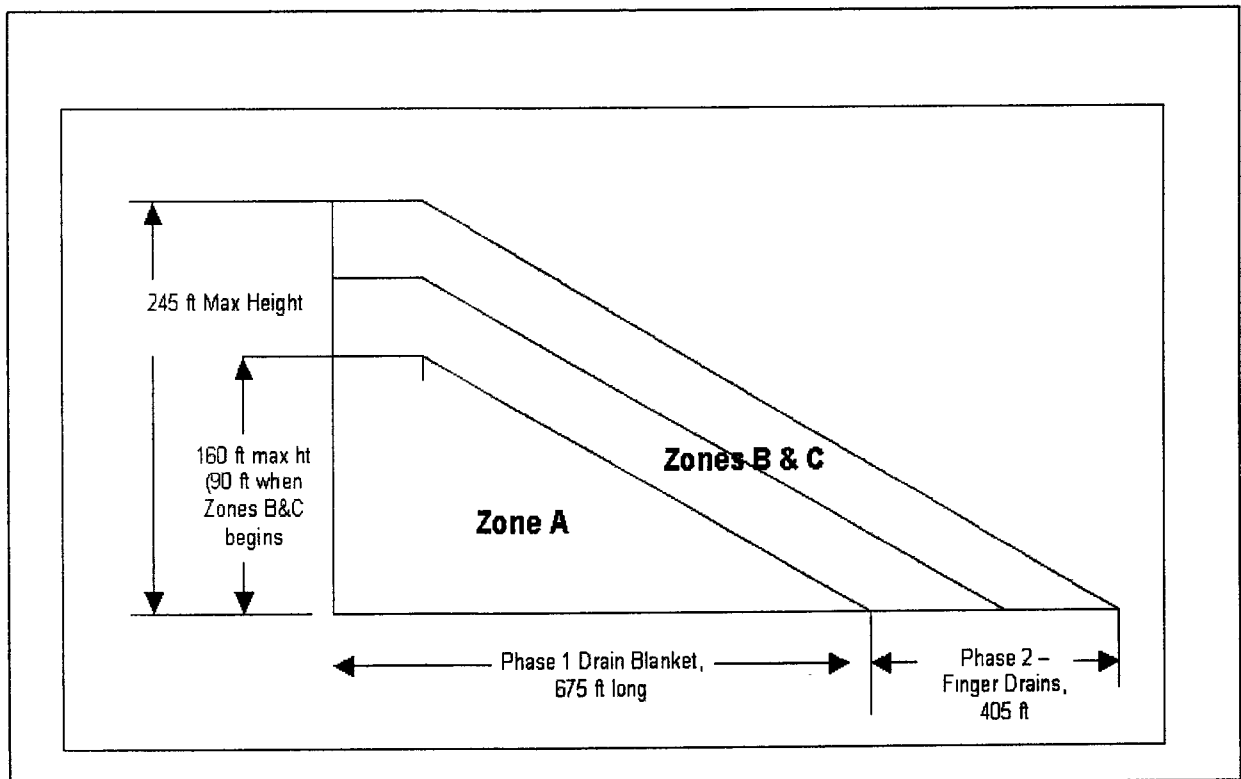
North Tailings Embankment Cross Section and Construction Zones.
